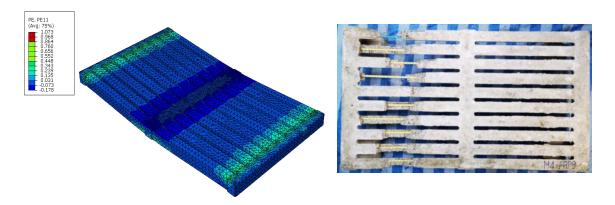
Maximum positive principal plastic strains of F9-100RAC slab and specimen at failure.
